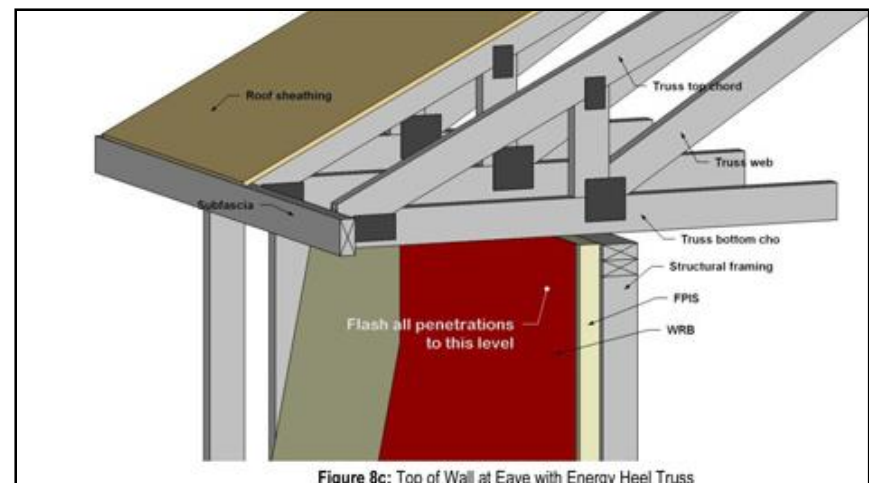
Top of Wall at Eave with Energy Heel Truss
